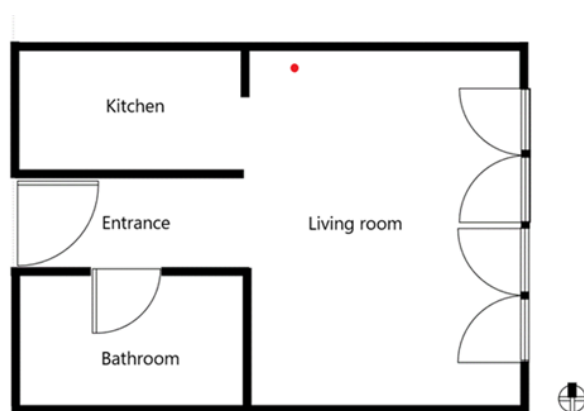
Floor plan of the tested apartment ventilation zone (red dot indicates the location of the instruments).
